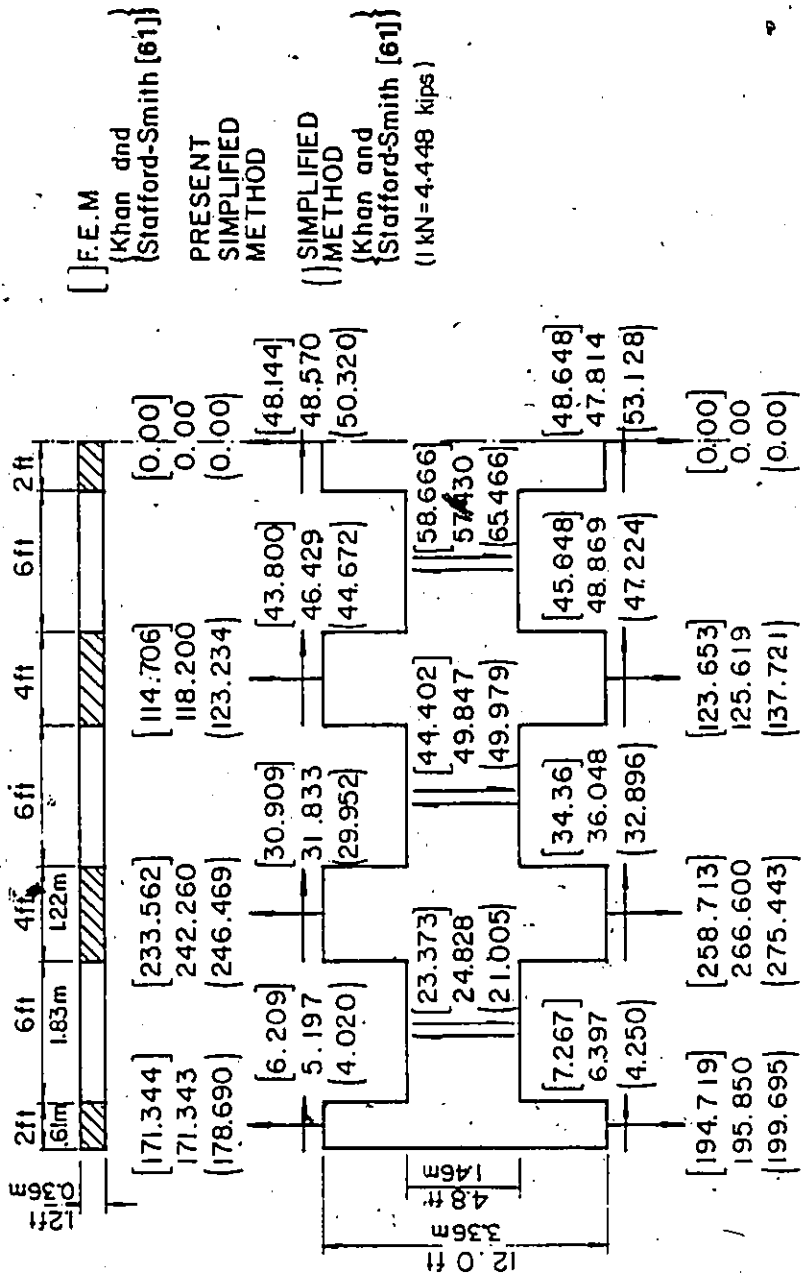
DESIGN FORCES IN COLUMNS AND BEAMS
